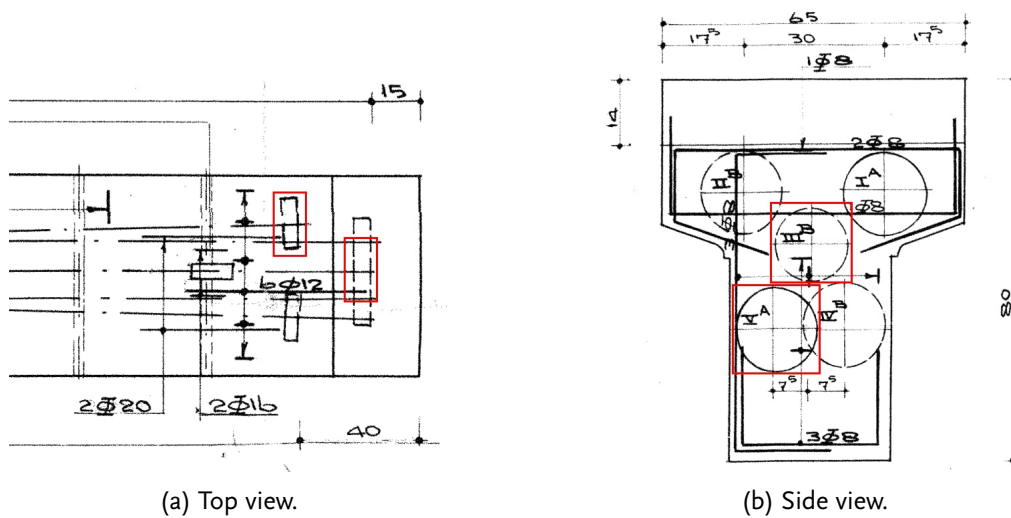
Location of the prestressing bars in beam 7 west face according to the original drawings.
